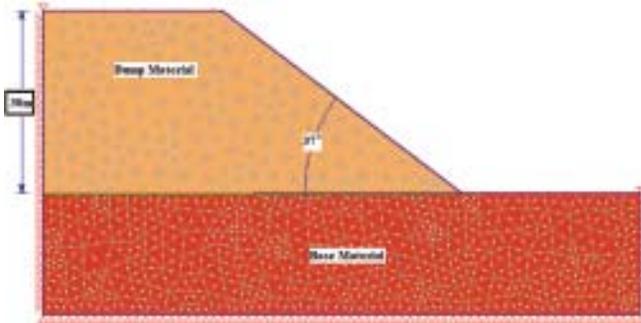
Base model of dump slope with 30m dump height and 37° slope angle
